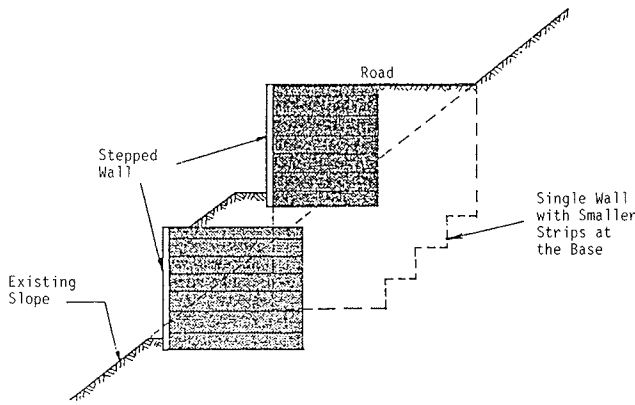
Construction of a stepped Reinforced Earth wall on an unstable slope.
